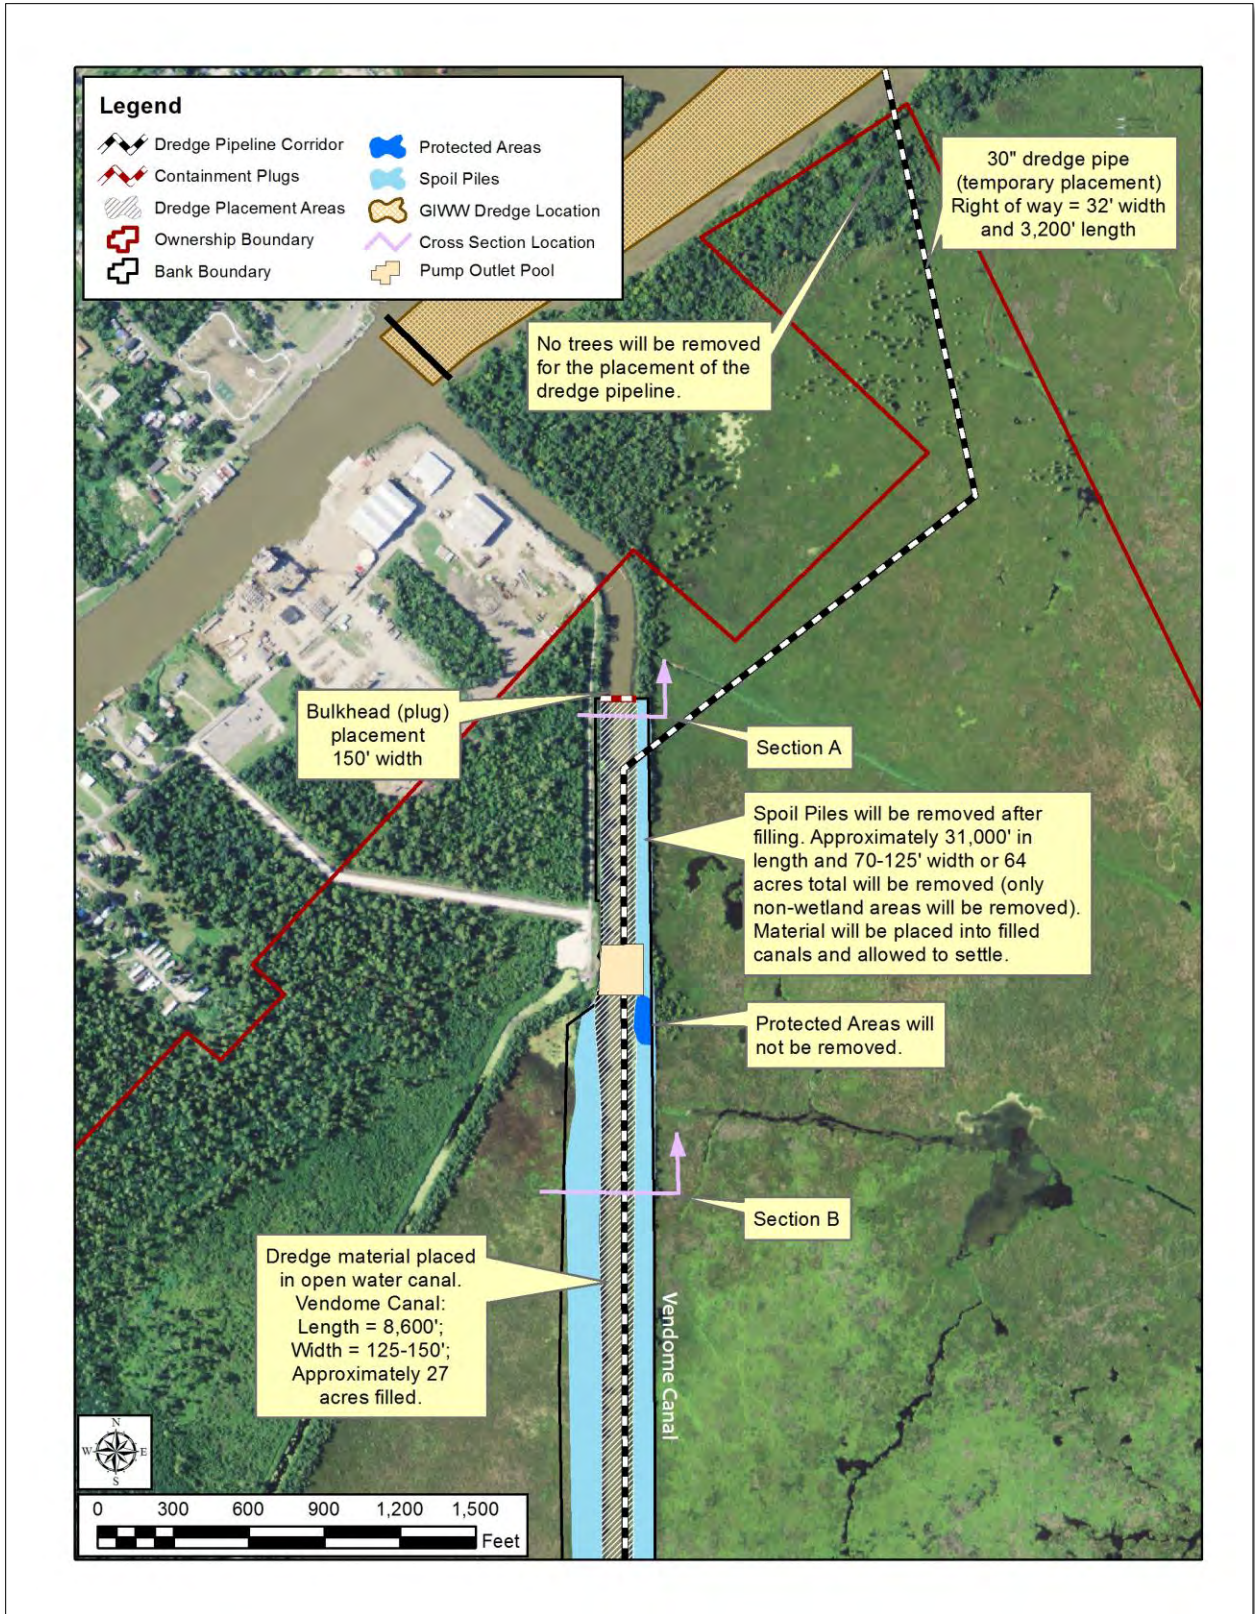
Dredge Placement, Pipe Location, Cross Section Locations, and Spoil Piles.
